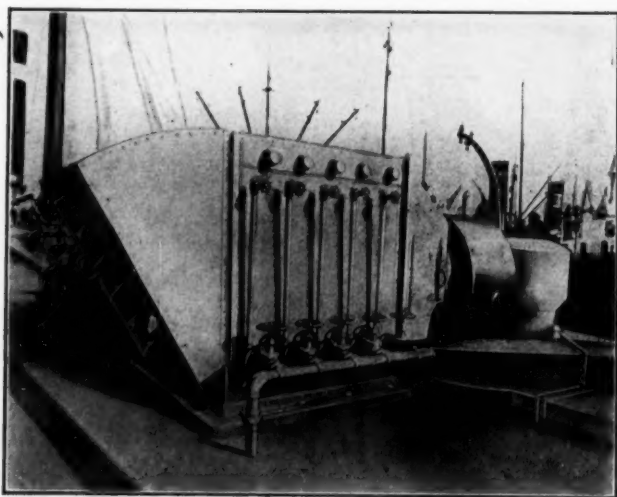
INLET END OF SUPPLY VENTILATING EQUIPMENT SHOWN IN FIG. 11
